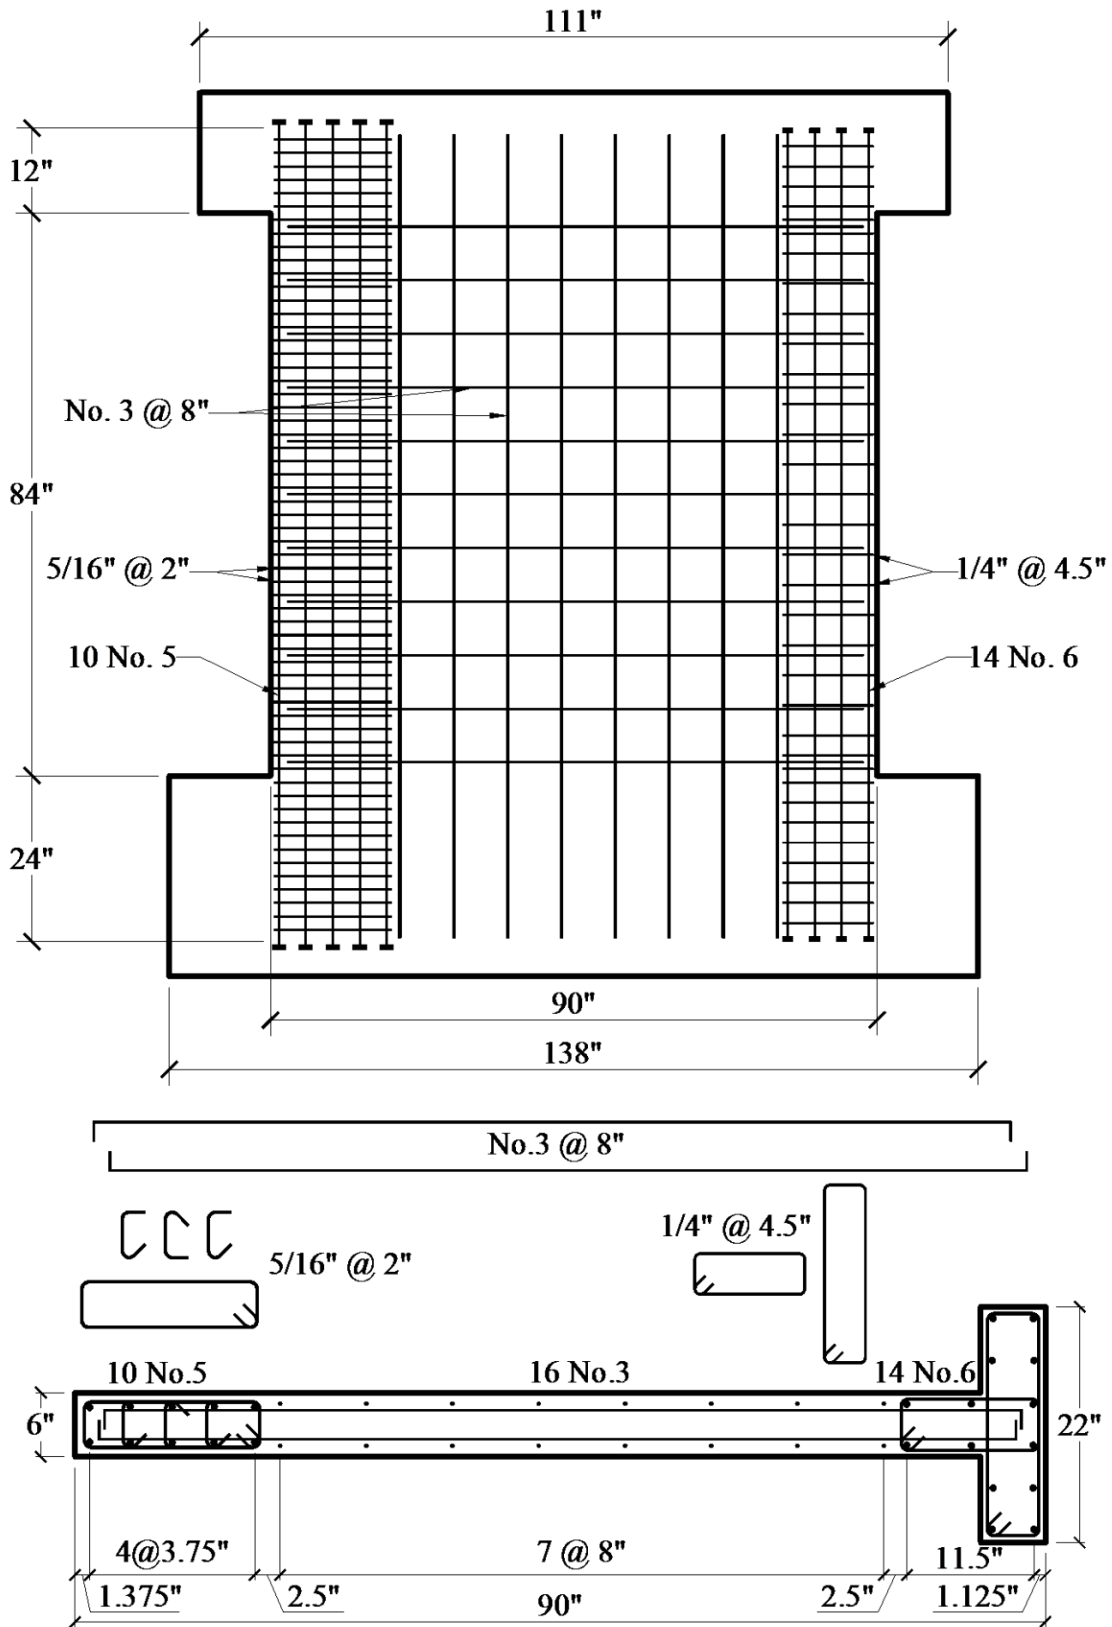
Specimen WP4 reinforcement (Conversion: 1"=25.4 mm)
